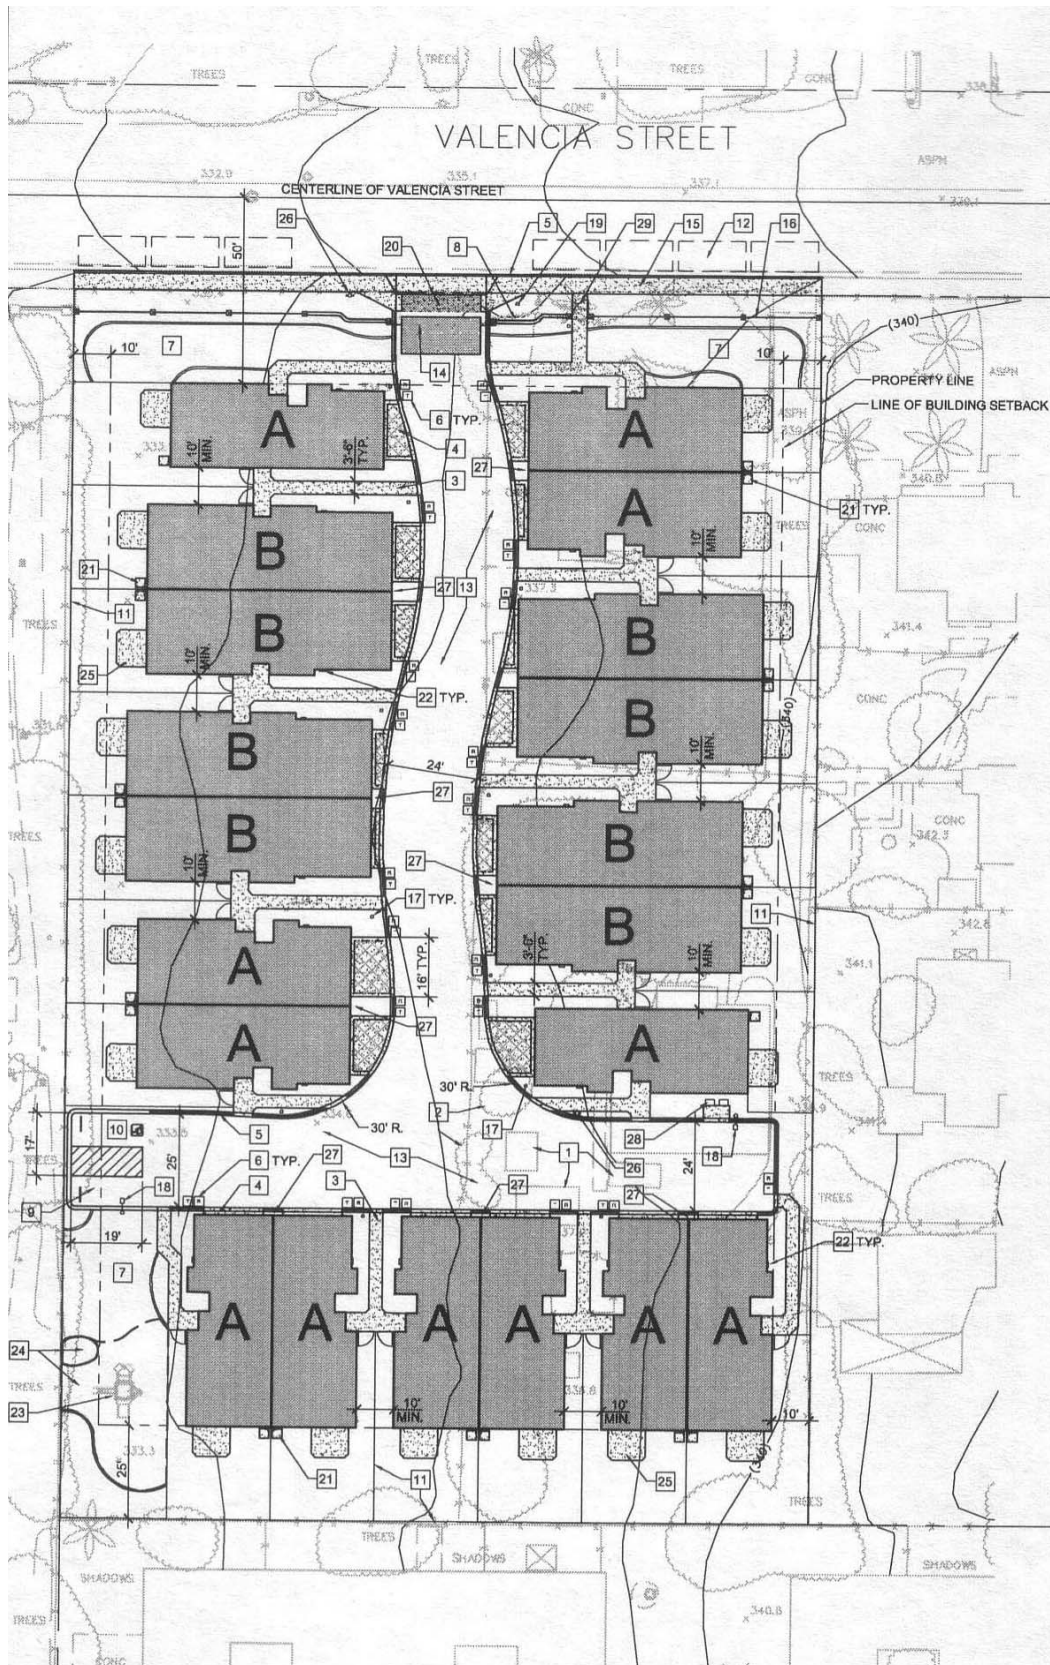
Preliminary Site Plan (Source: Witkin Design, Inc.)
